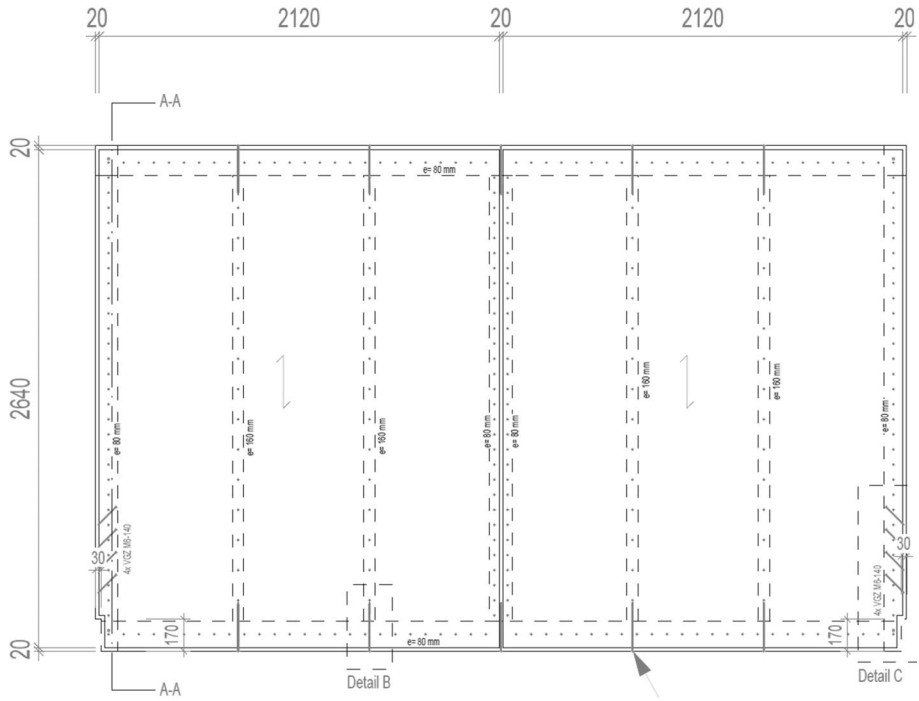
Plan and details of timber frame wall sheathed with OSB (Geiser et al. 2009)
